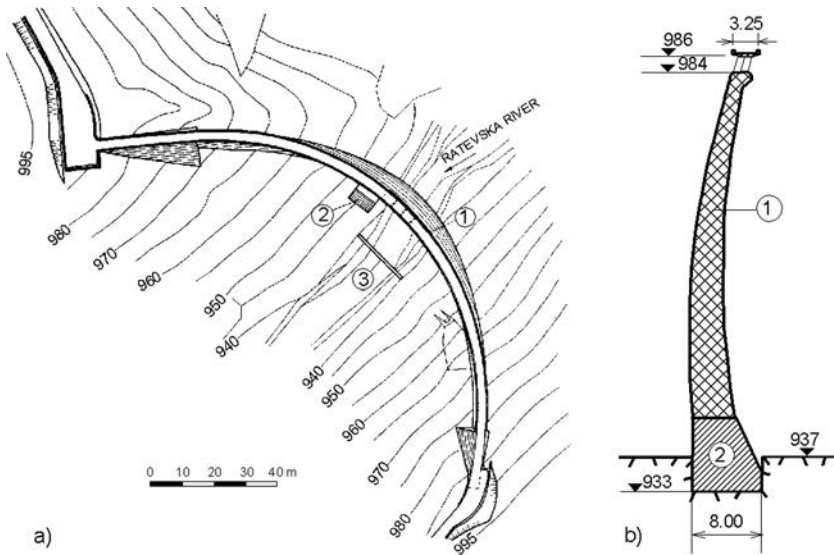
Ratevska River dam. (a) Layout: (1) spillway; (2) bottom outlet; (3) transverse concrete sill. (b) Section through the overflow part: (1) dam's body; (2) concrete foundation block.
